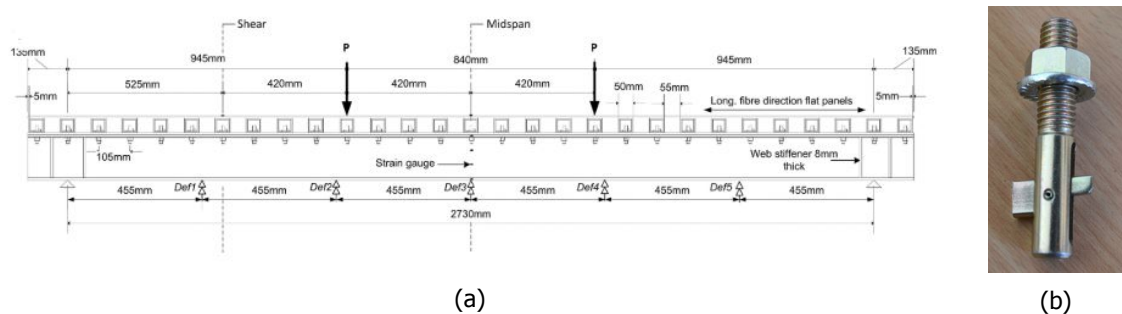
Specimen geometry of the FRP-steel composite beam (a) using blind bolts (b) [31]
